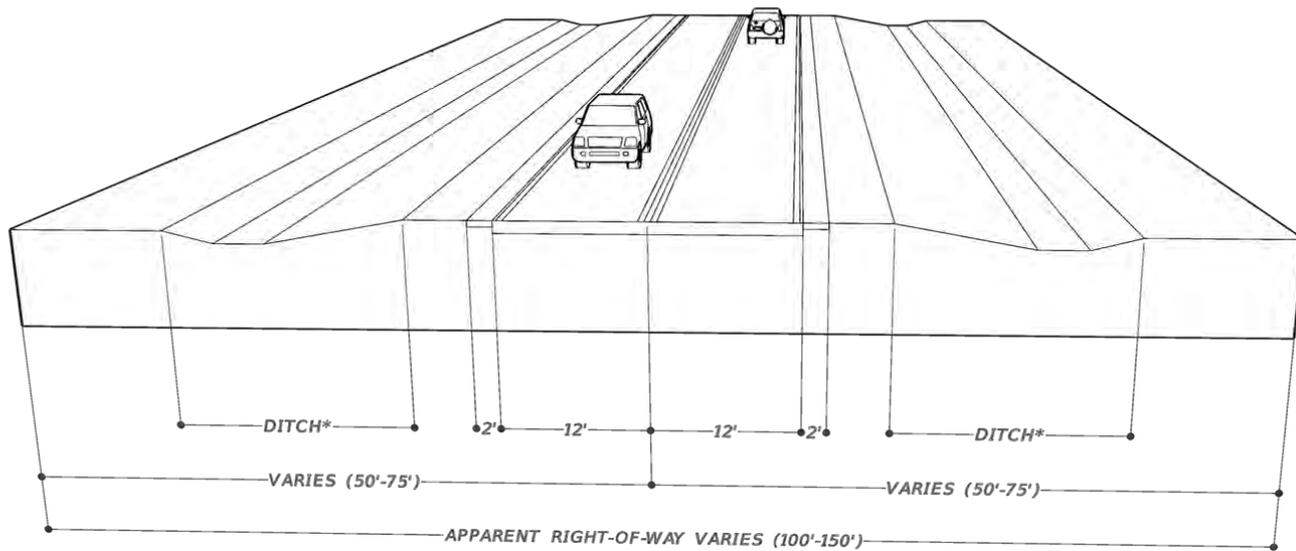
| Existing Typical Section – Railroad Grade Road from Dorr Road to S.R. 19
